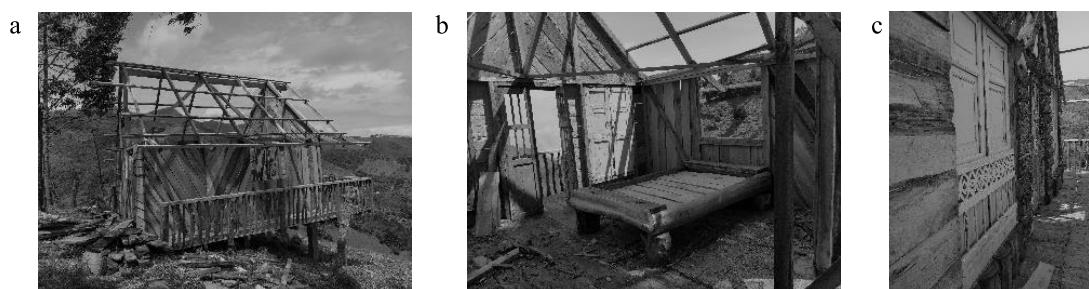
(a) Wooden house; (b) Interior of the wooden house; (c) Detail of the door and window
